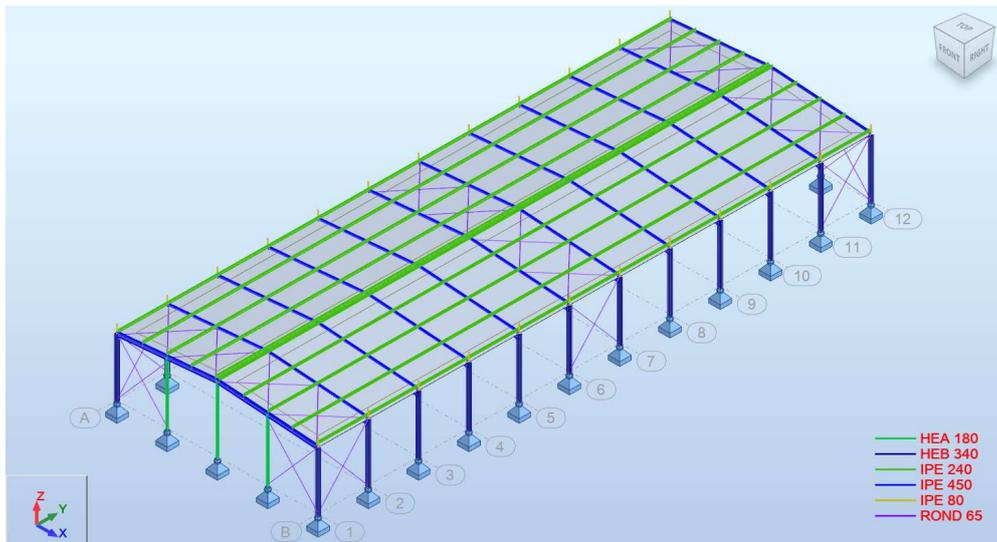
Design model of the building framework; drawings, spatial view of the main bolted and welded joints
